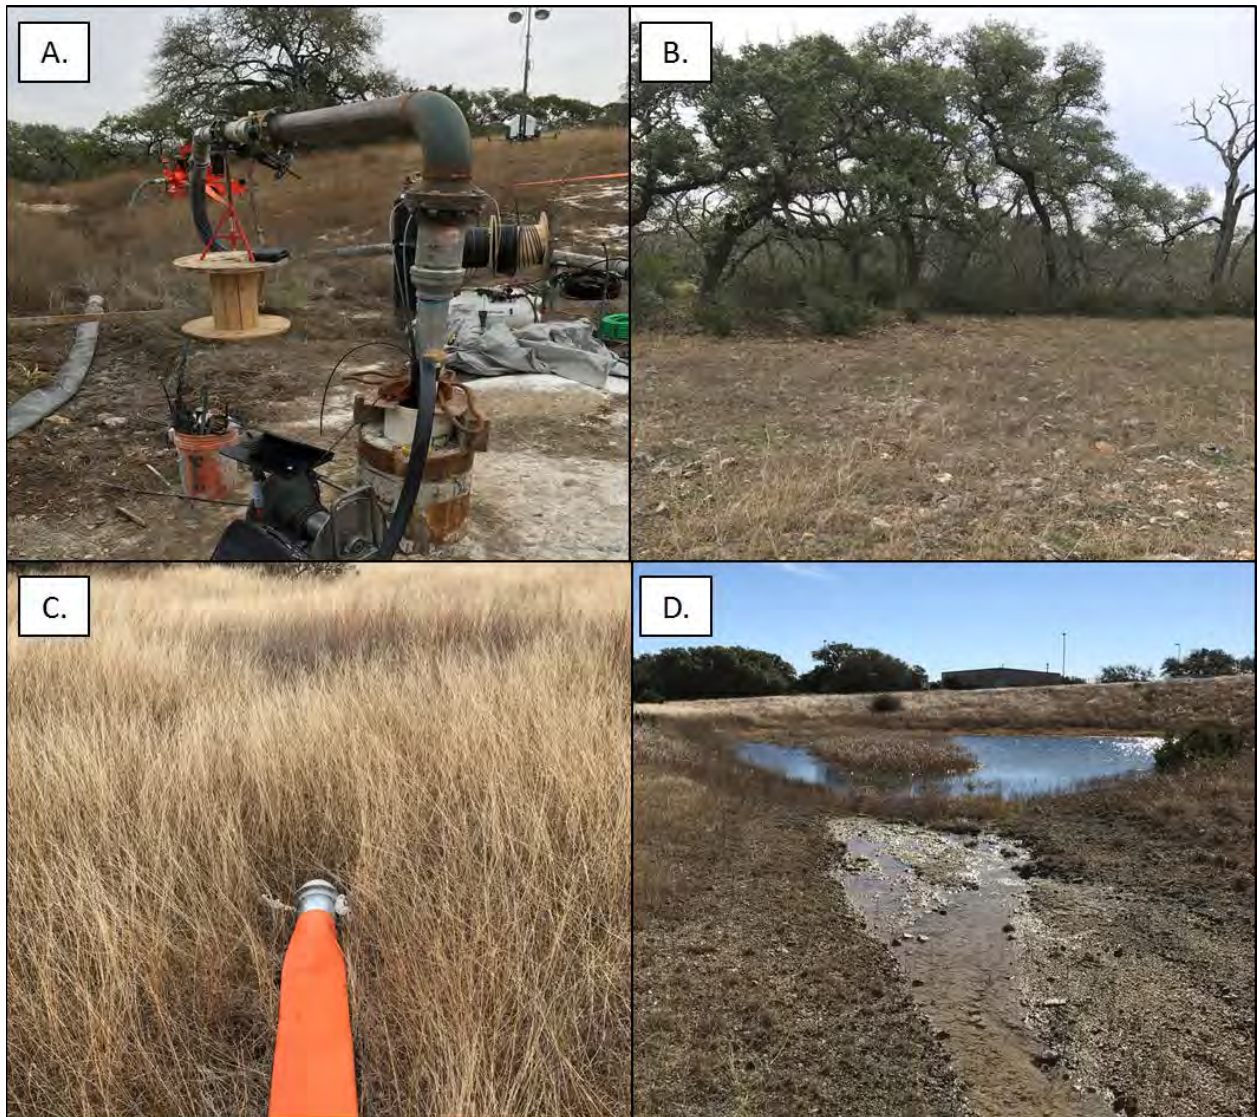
Photos from well site area – 1) Looking southeast toward Odell Well No. 2; 2) looking south at area vegetation; 3) looking southwest from pipe discharge; 4) looking east towards Odell storage pond OA along discharge channel
